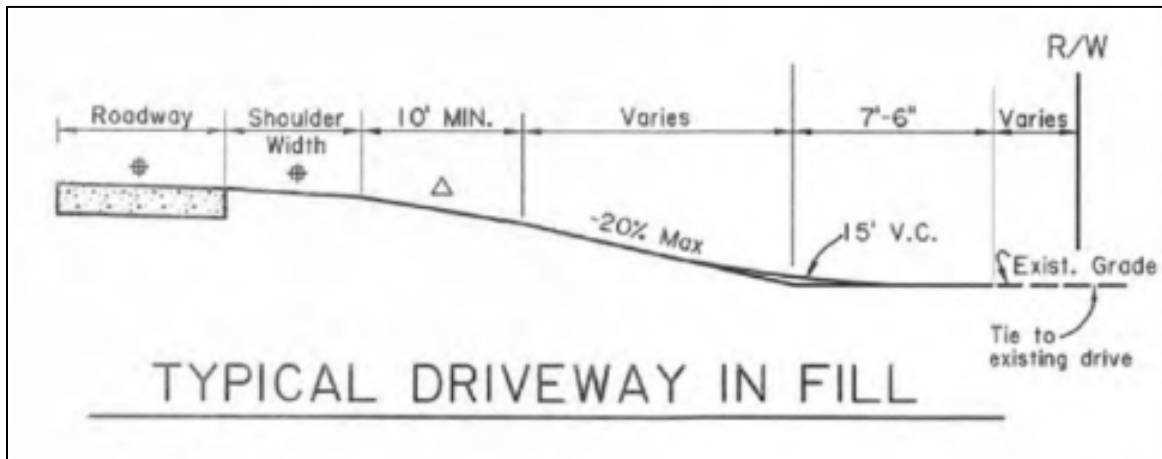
Driveway Access Geometric Requirements (Source: LA DOTD Standard Plan DW-01)
